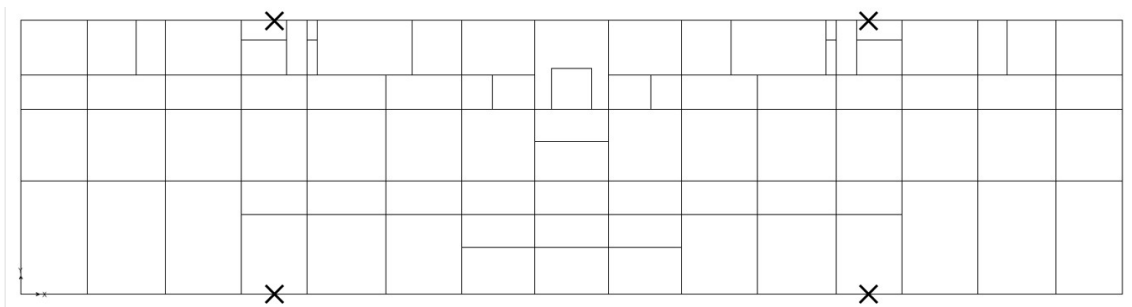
Damper Placement at 4th floor (SR-X); ODAM: 4 dampers
